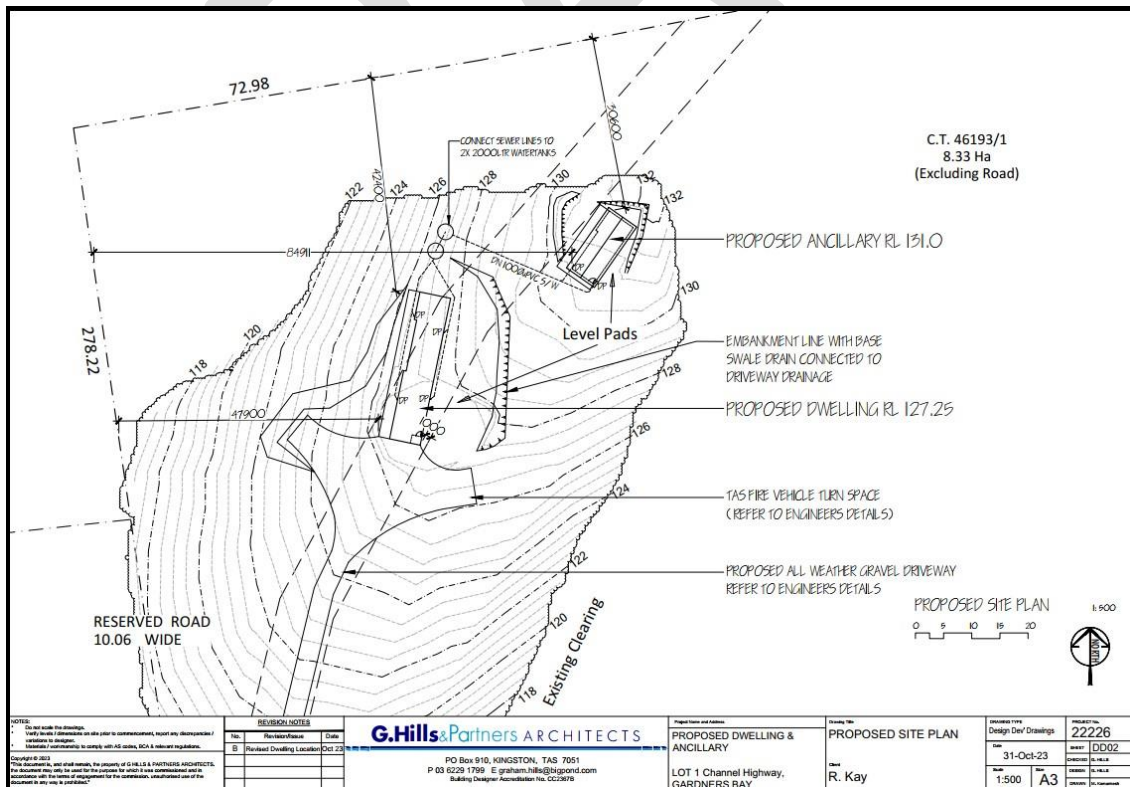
Site plan of proposed development (REF: G. Hills & Partners Architects, Proposed dwelling, ancillary & shed, Lot 1 channel Highway, Gardners Bay, Project 22226).
